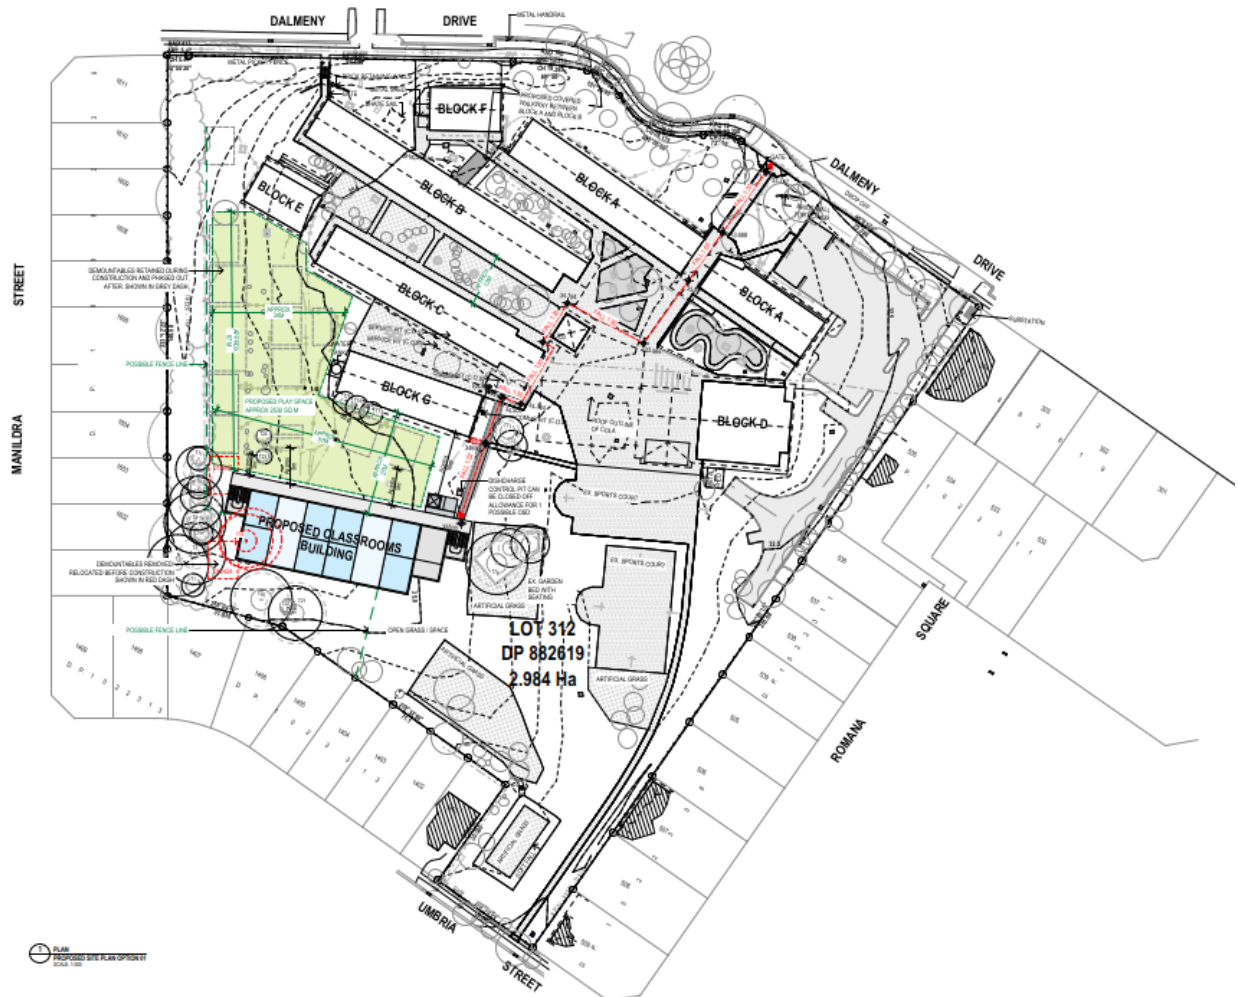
Proposed Site Plan Option 1, 7068DA01, dated 19/09/2024, RevA
